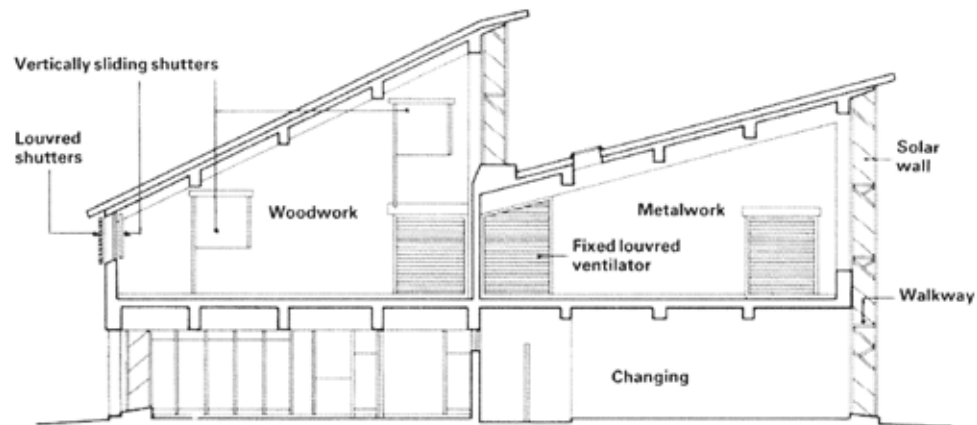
Transverse section through solar wall of St George's Secondary School, 1:200
